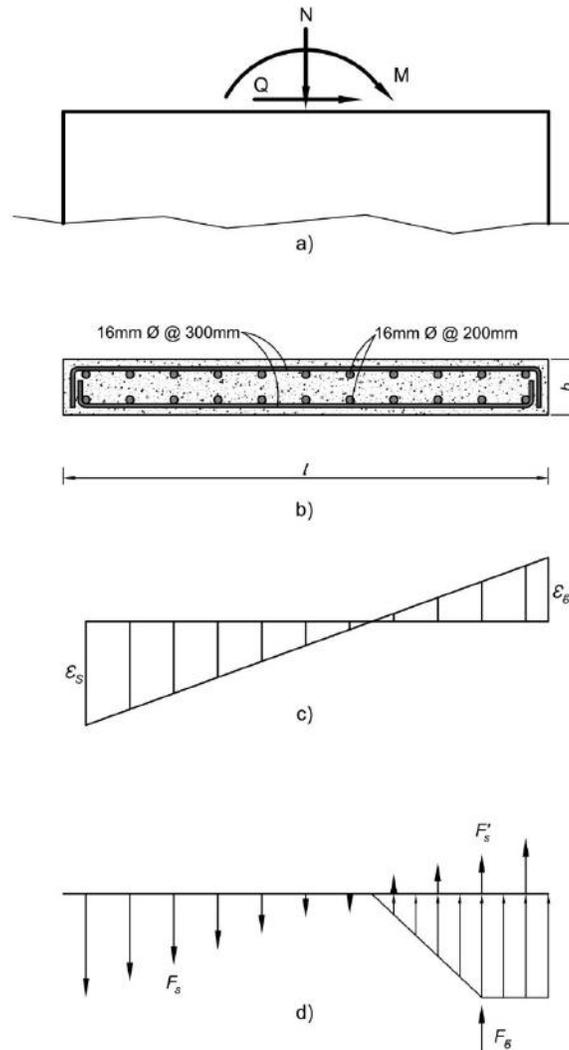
RC shear wall subjected to shear force, axial load and bending: a) wall elevation showing design forces; b) wall cross-section; c) strain distribution, and d) distribution of internal forces.
